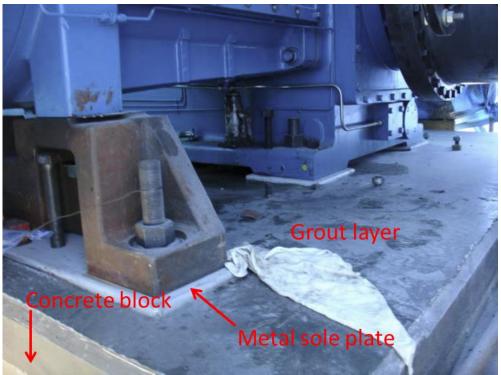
This example shows the foot for a block-mounted JGV6 medium speed compressor. The compressor foot is held against a metal sole plate by an anchor bolt. The anchor bolt is set into the. The sole plate is grouted into the concrete [6]
